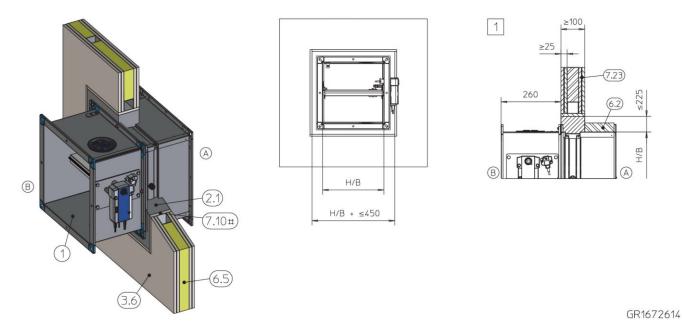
Mortar-based installation into a compartment wall or safety partition wall
